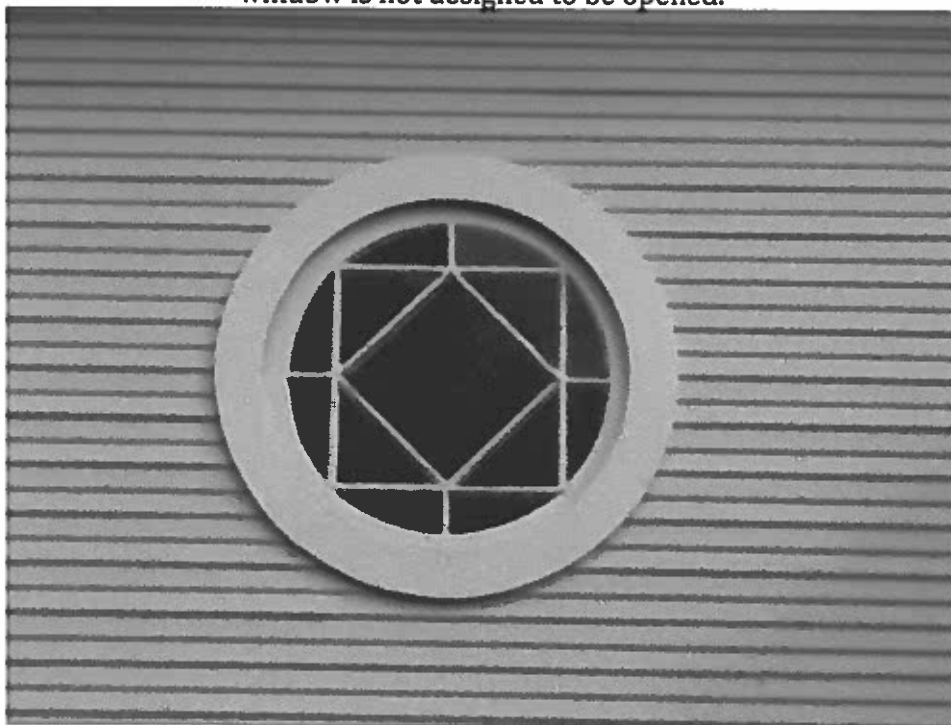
2<sup>nd</sup> floor round window to the middle room. This window is not designed to be opened.
